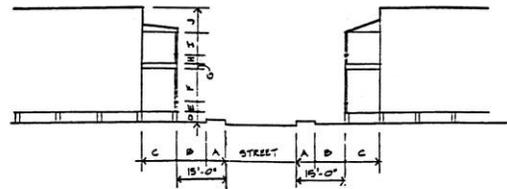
WOOD COTTAGES DISTRICT-STREETSCAPE, TYPE 2
